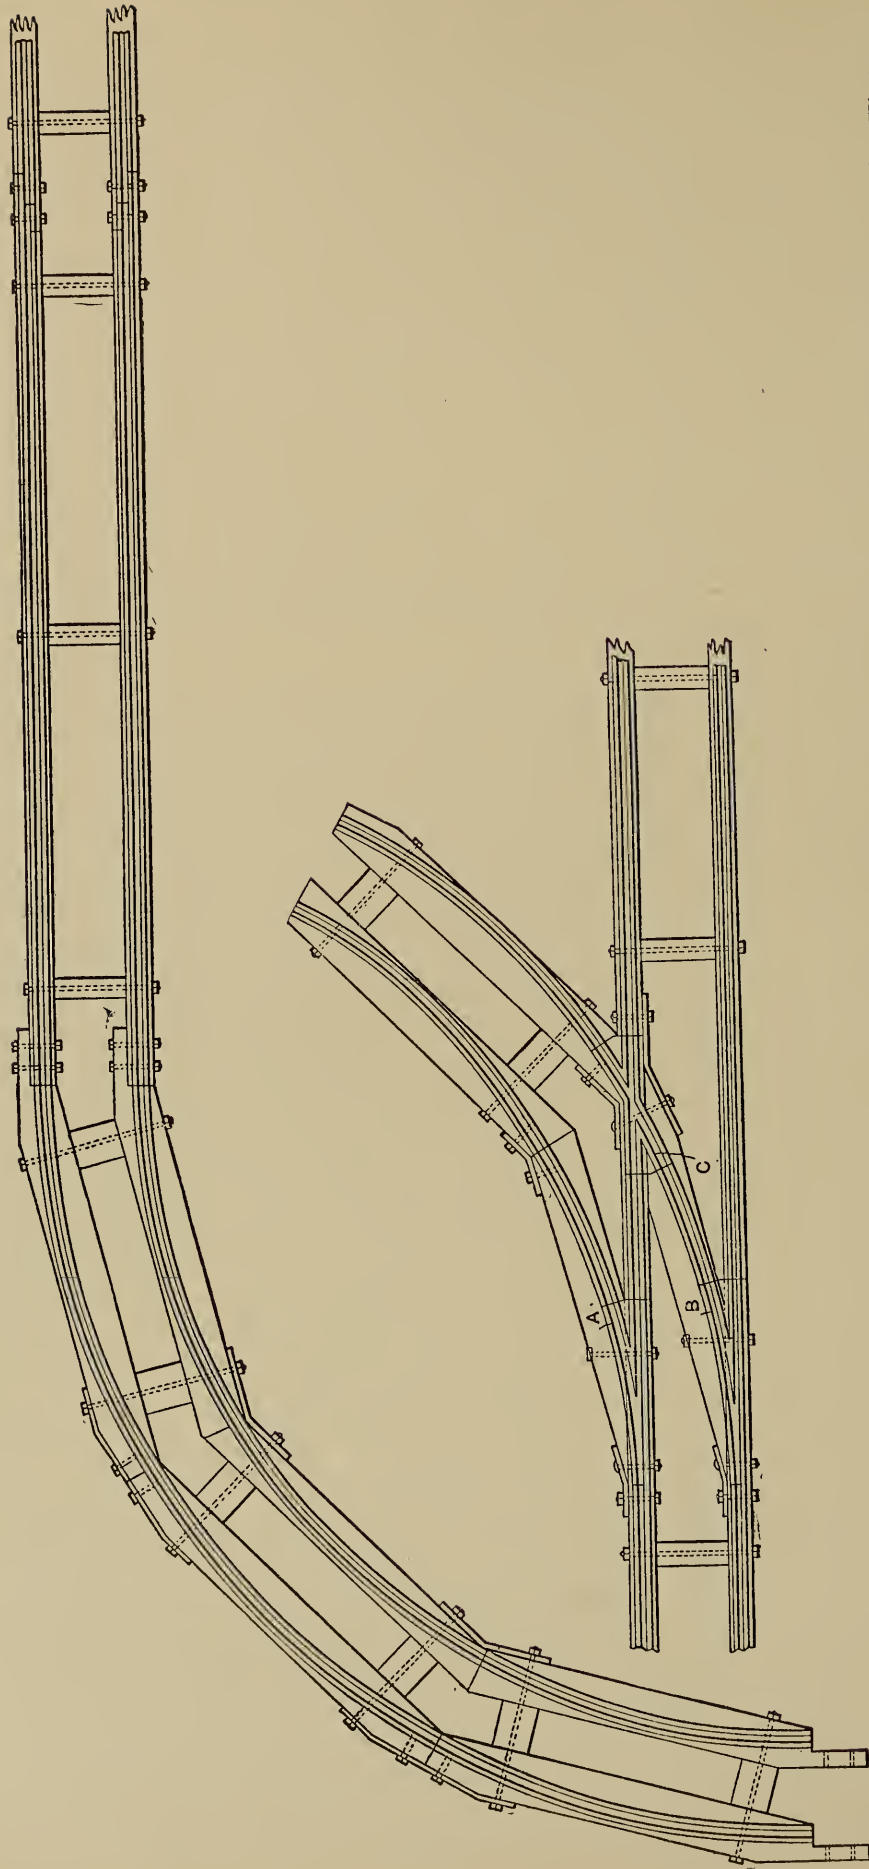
Plan of Curve and Straight Track, showing Method of Joining.
